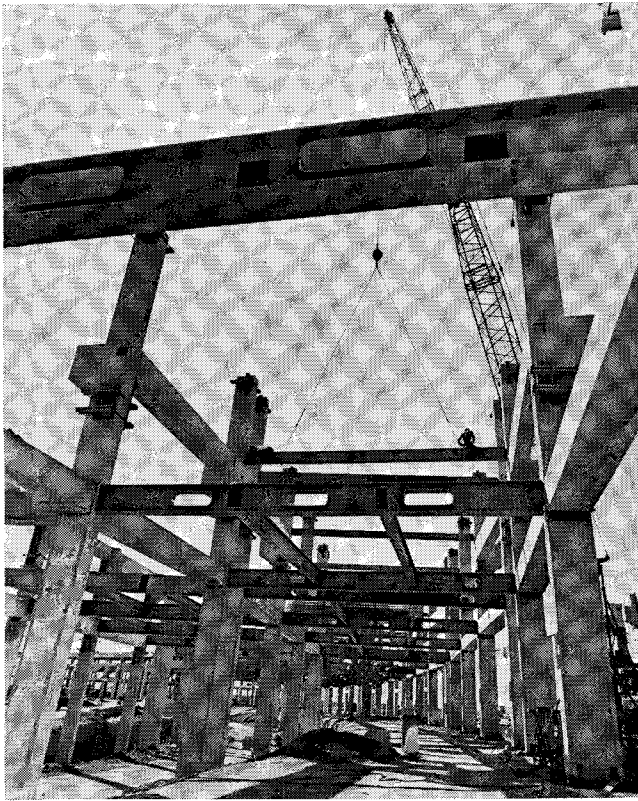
Concourse level framing consisted of castled steel girders, secondary beams, and metal deck with a concrete deck (to allow flexibility in the future floor penetration). Use of friction clamps to support longitudinal frame members eliminated need to shore to grade.
